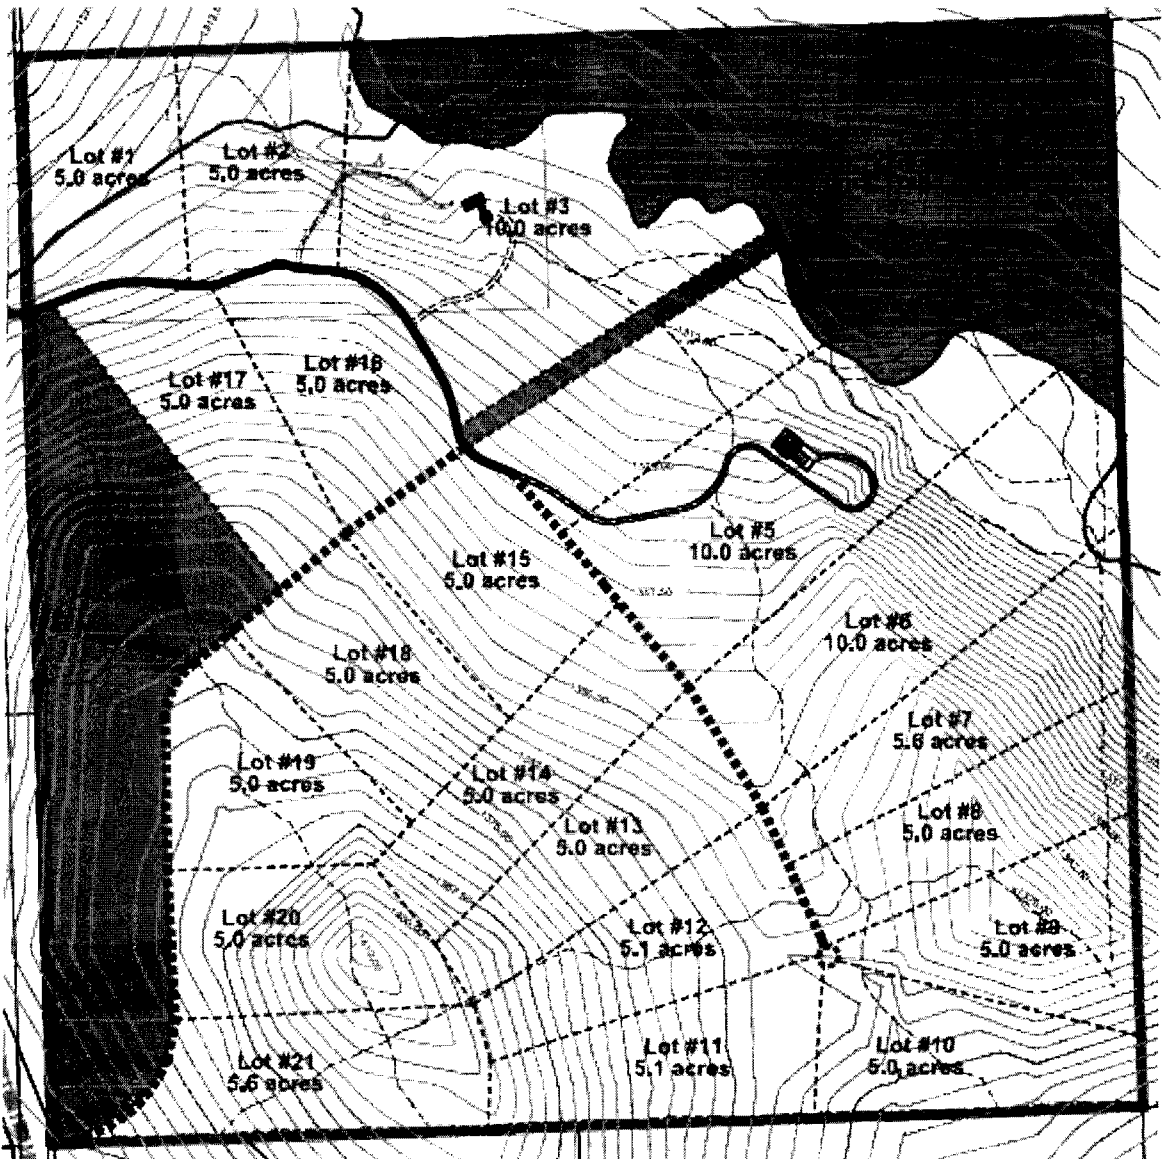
Calgary Foothills Project – Option 2 Subdivision Plan
